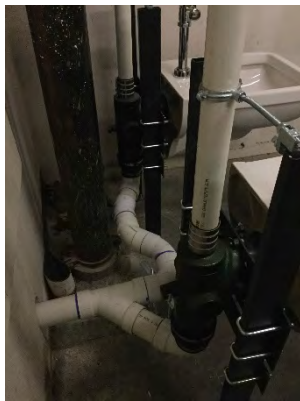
Soiled Utility Room – Drainage and Ventilation Connections for New Sinks
